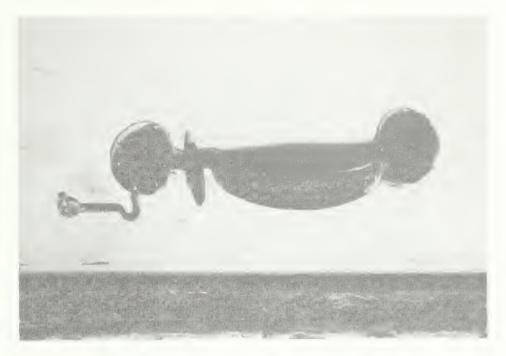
Second-story kitchen hall (Room 206), east wall, detail of doorway D206 hardware.
